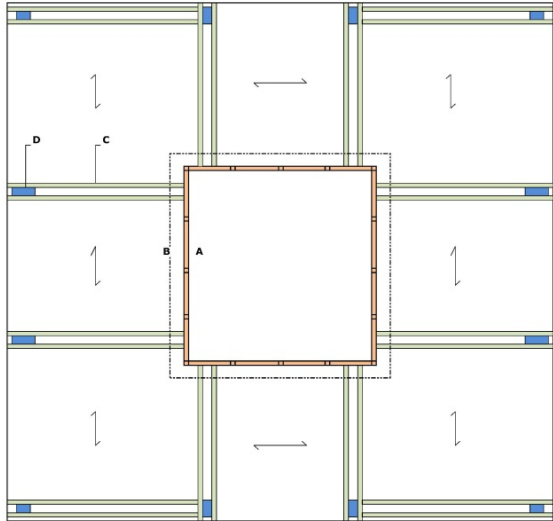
Plan of structure, A – IPC (integrated panel core), B - 'hoop' beam at each floor level, C – engineered timber floor beam, D – engineered timber column. arrows indicate floor joist span
